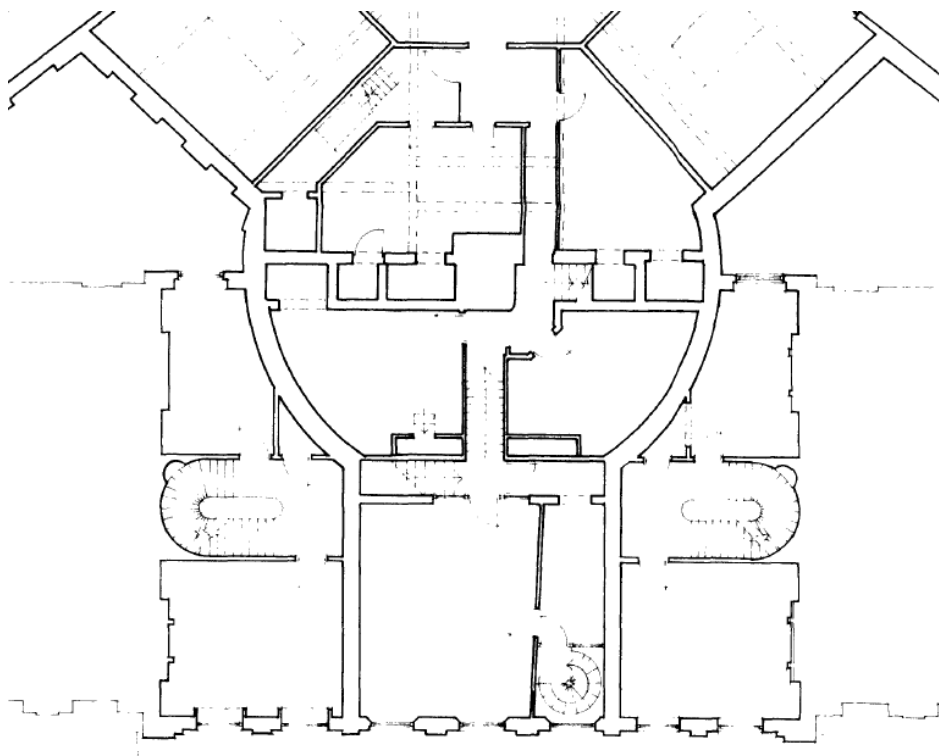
Existing first floor plan of nos. 17-19. Camden planning ref: HB/9370268.
